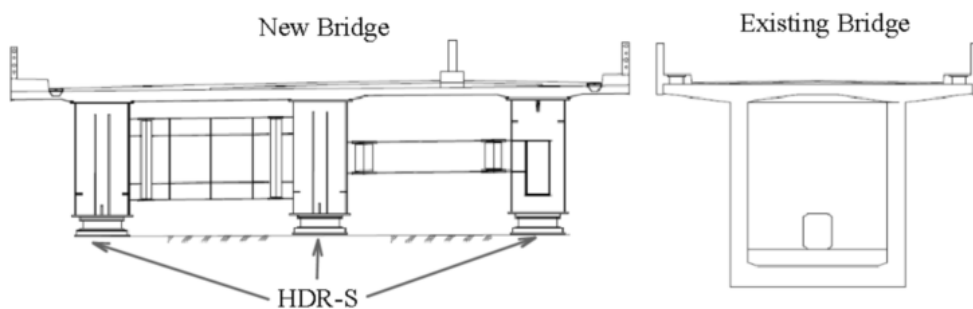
2nd Meghna Bridge and existing Meghna Bridge
